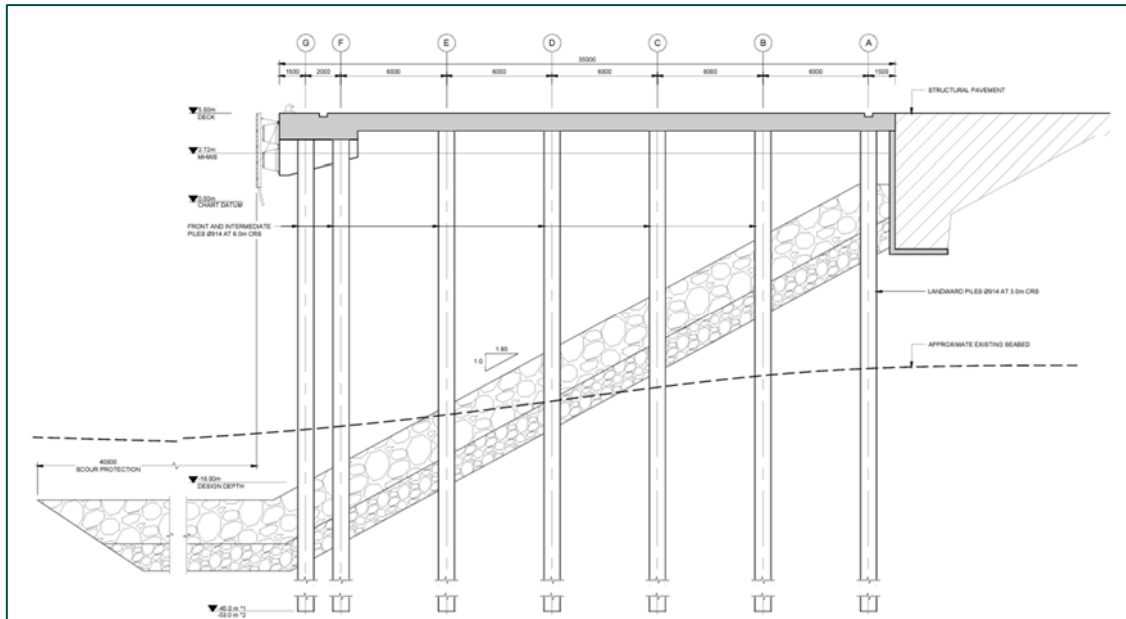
Indicative cross-section of proposed wharf structure (source: Appendix 18: Design Report).
